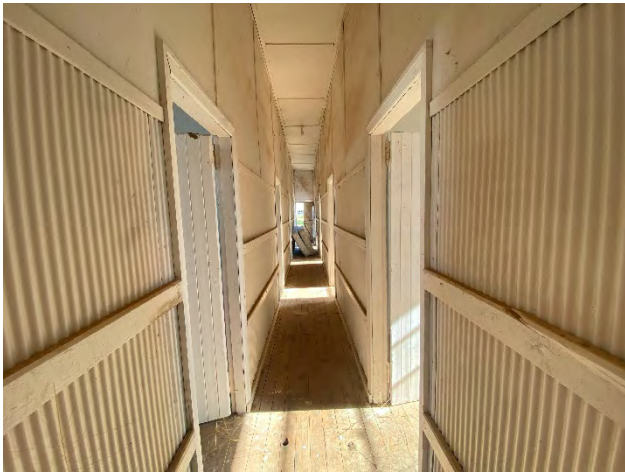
Narrow hallway within Building A dividing bedrooms to the north and south. View west.
